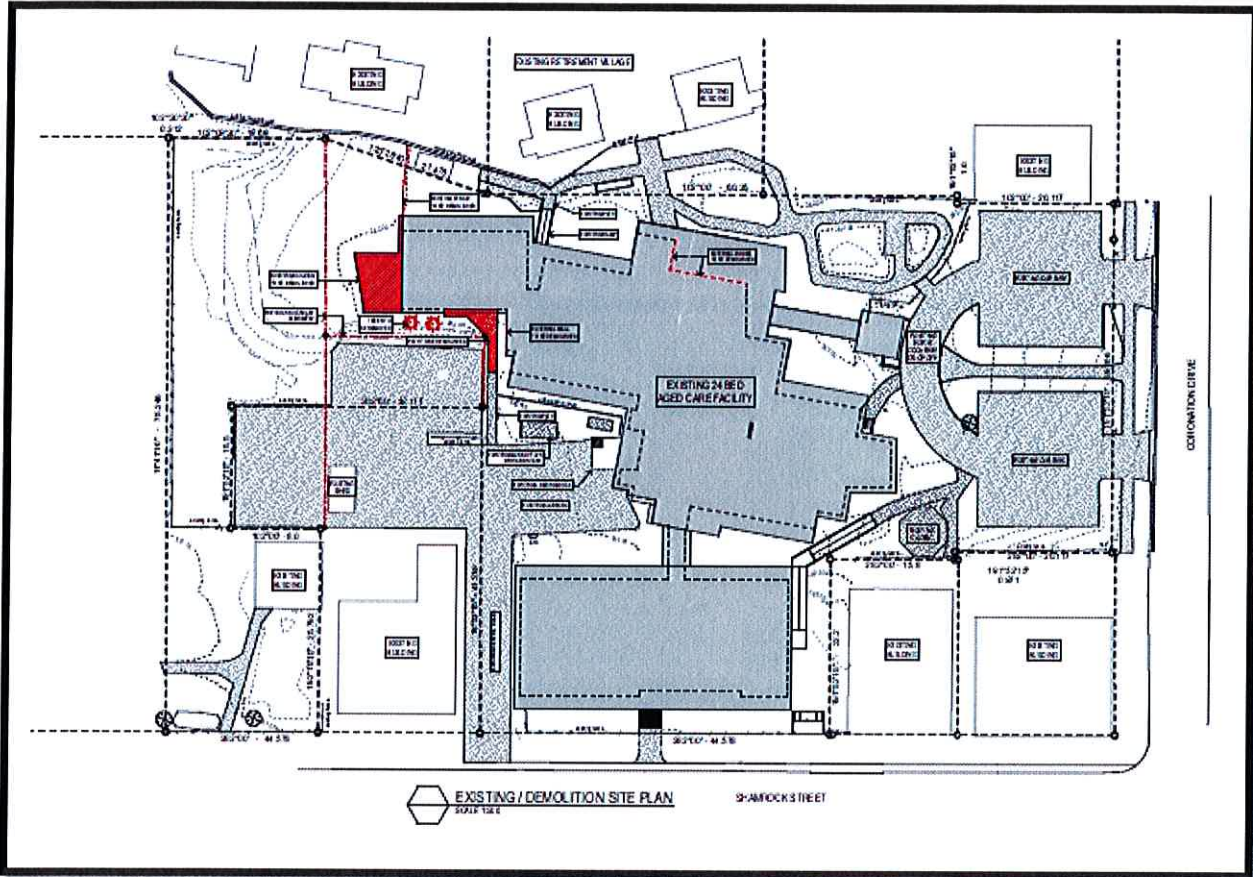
EXISTING / DEMOLITION SITE PLAN (Source: Extract from approved plans)
